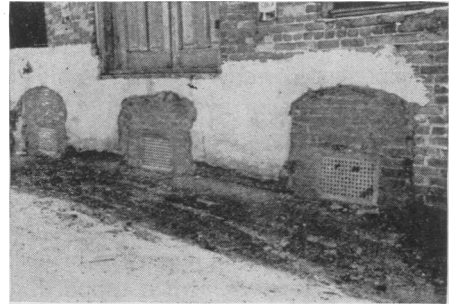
Vent stoppage. Former ventilator openings in exterior wall closed with brick, perforated galvanized metal and cement.
